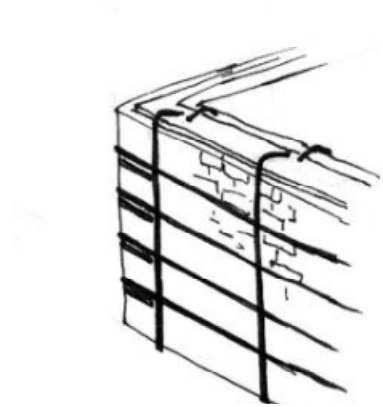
Reinforcing in an Adobe House with Tire Straps (Charleson, 2009)
